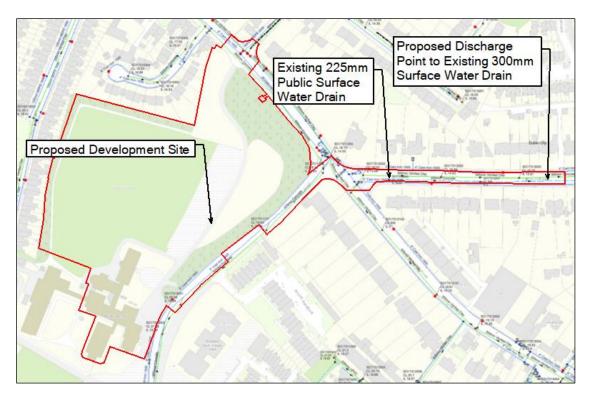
Extract from Irish Water's Network Plan (Site Boundary Indicative Only)
